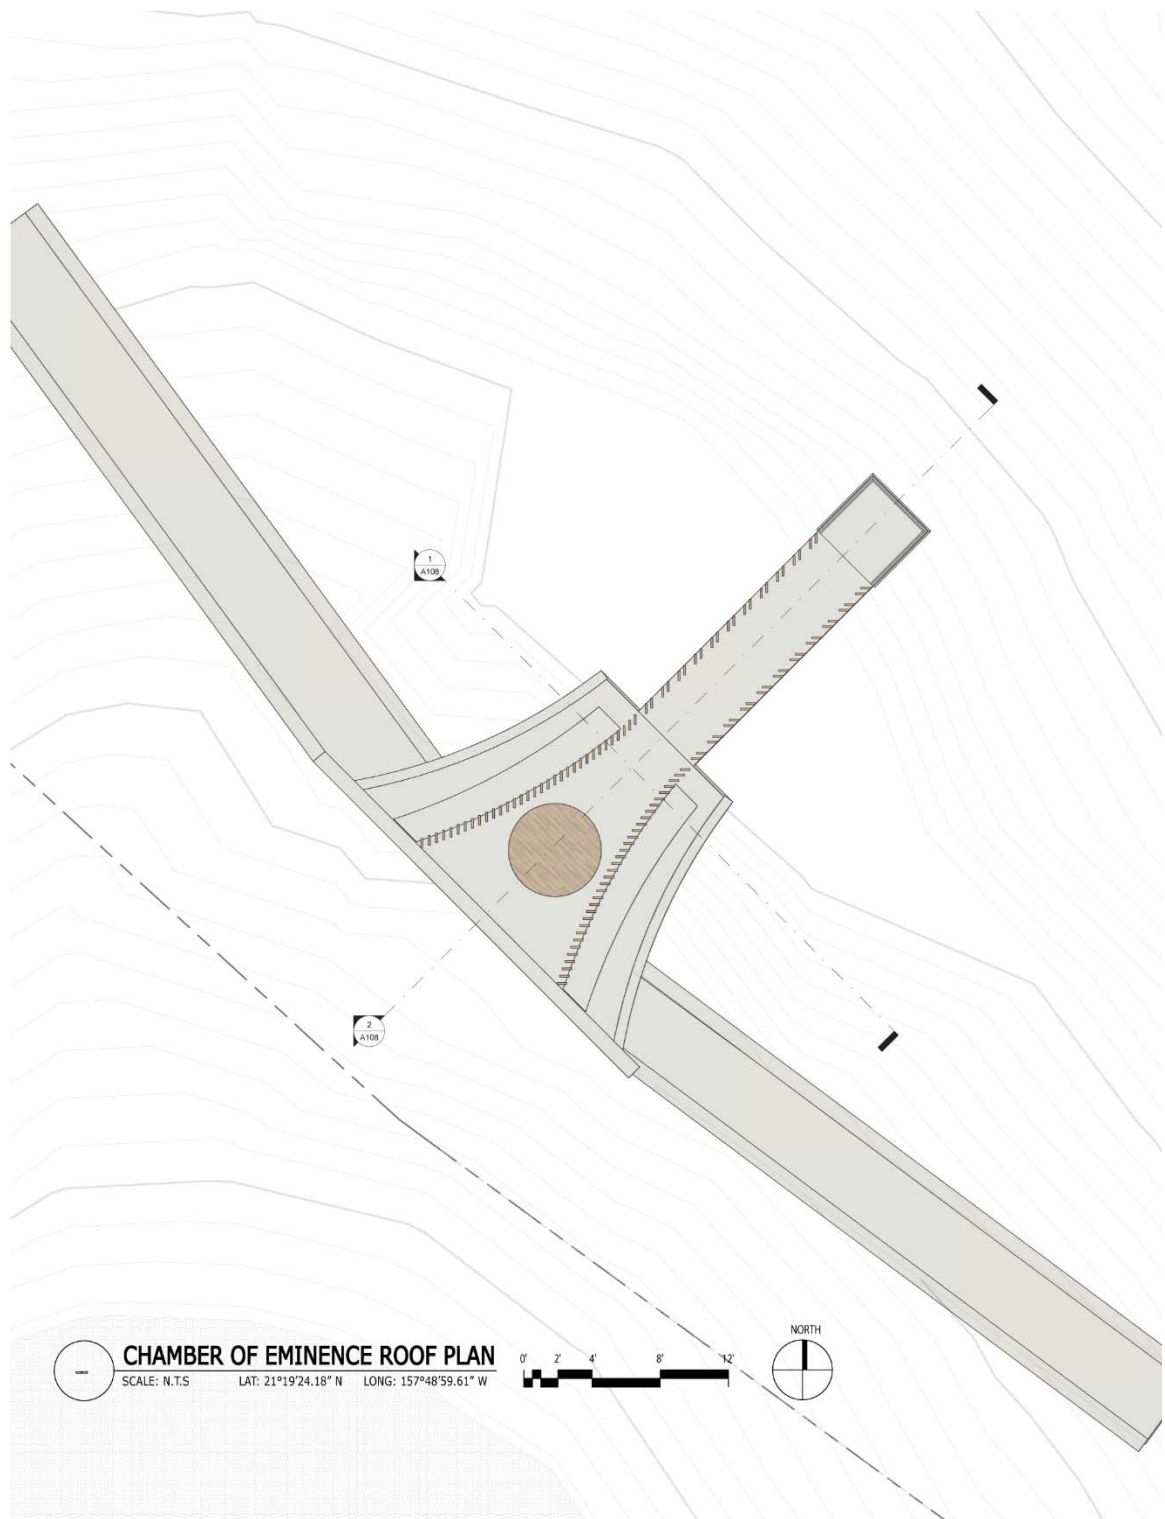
Chamber of Eminence Roof Plan. Made by Author.
